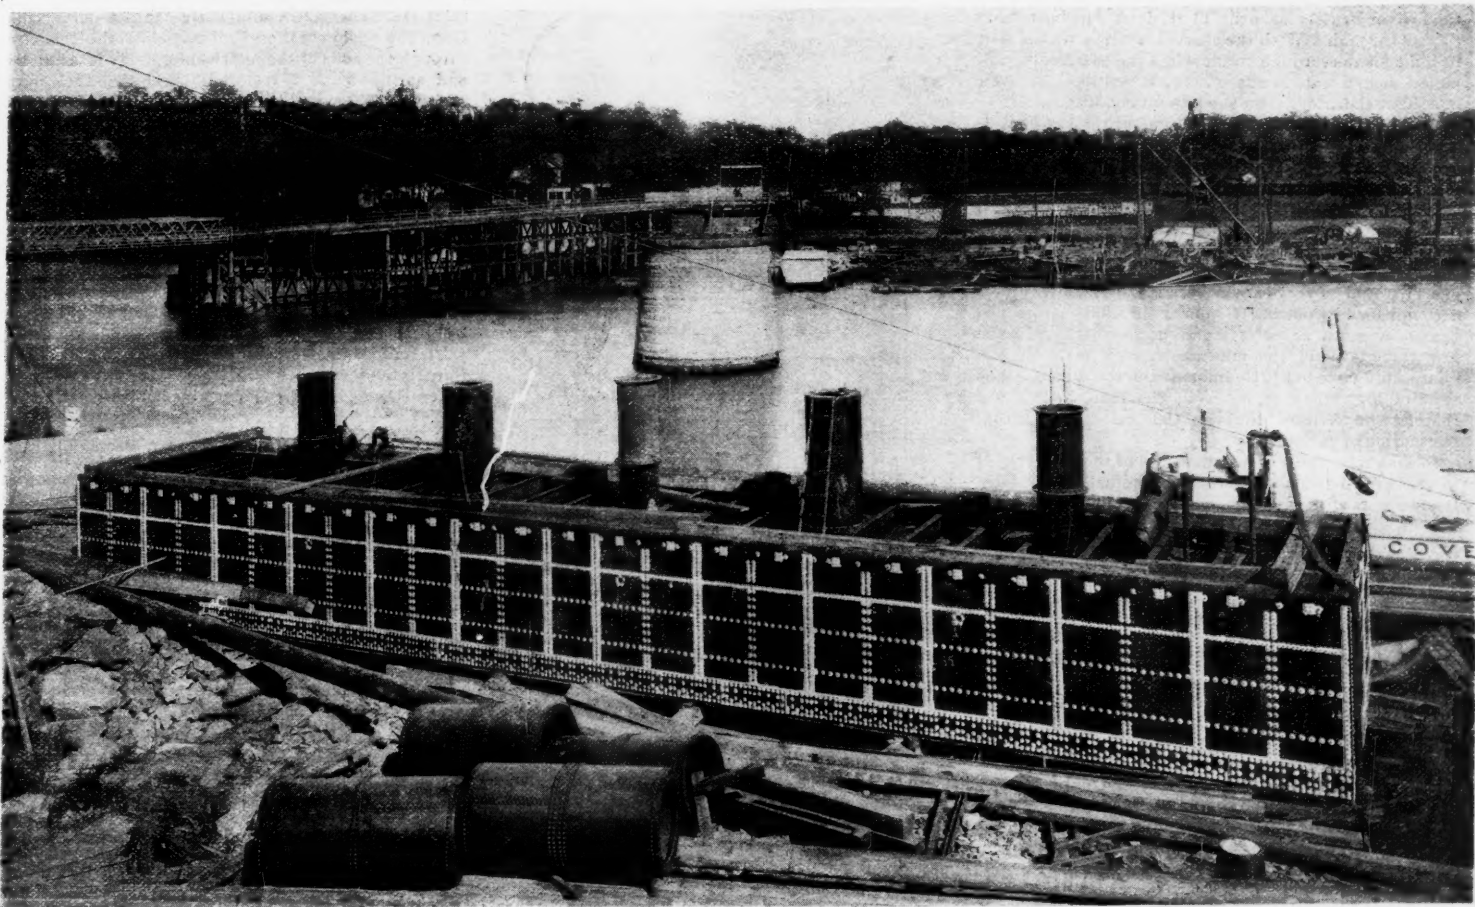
CAISSON FOR PIER 1—SEVENTH AVENUE DRAWBRIDGE, NEW YORK.
